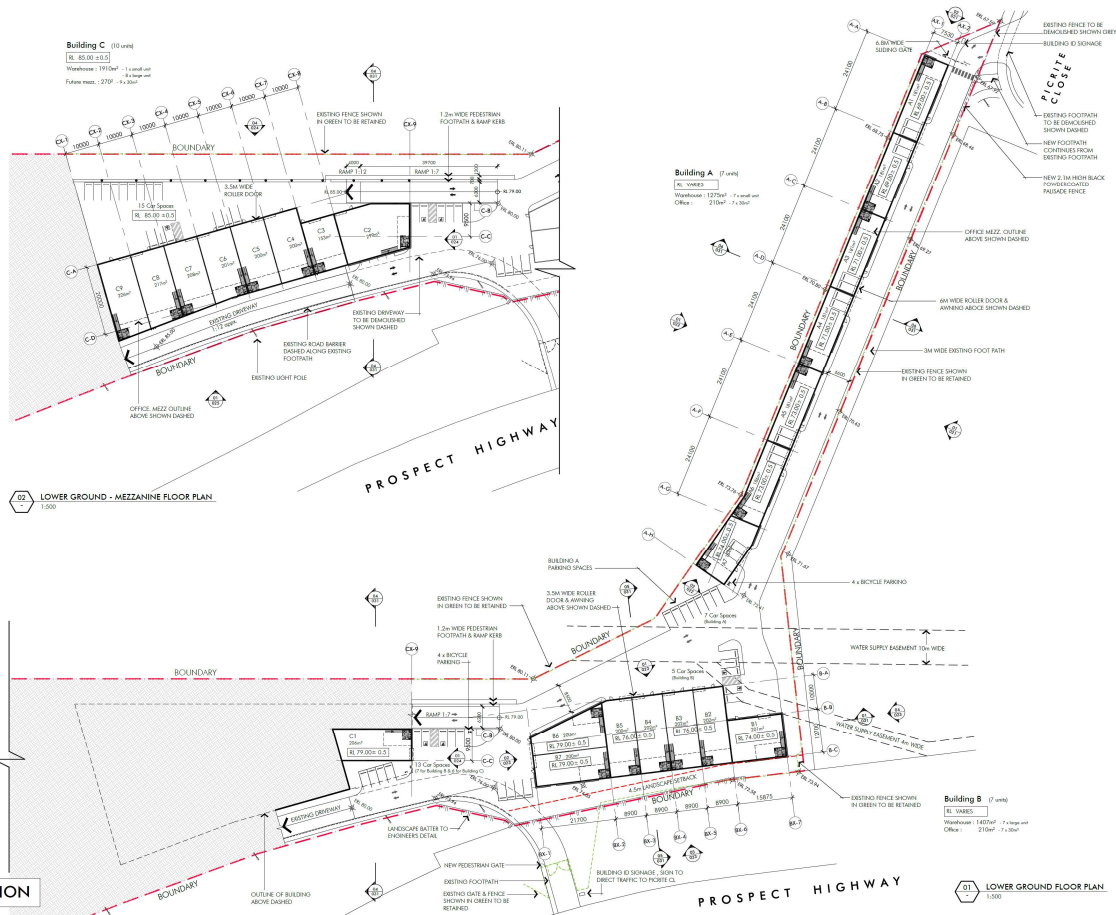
Lower Ground Floor Plan (Source: Nettleton Tribe)
